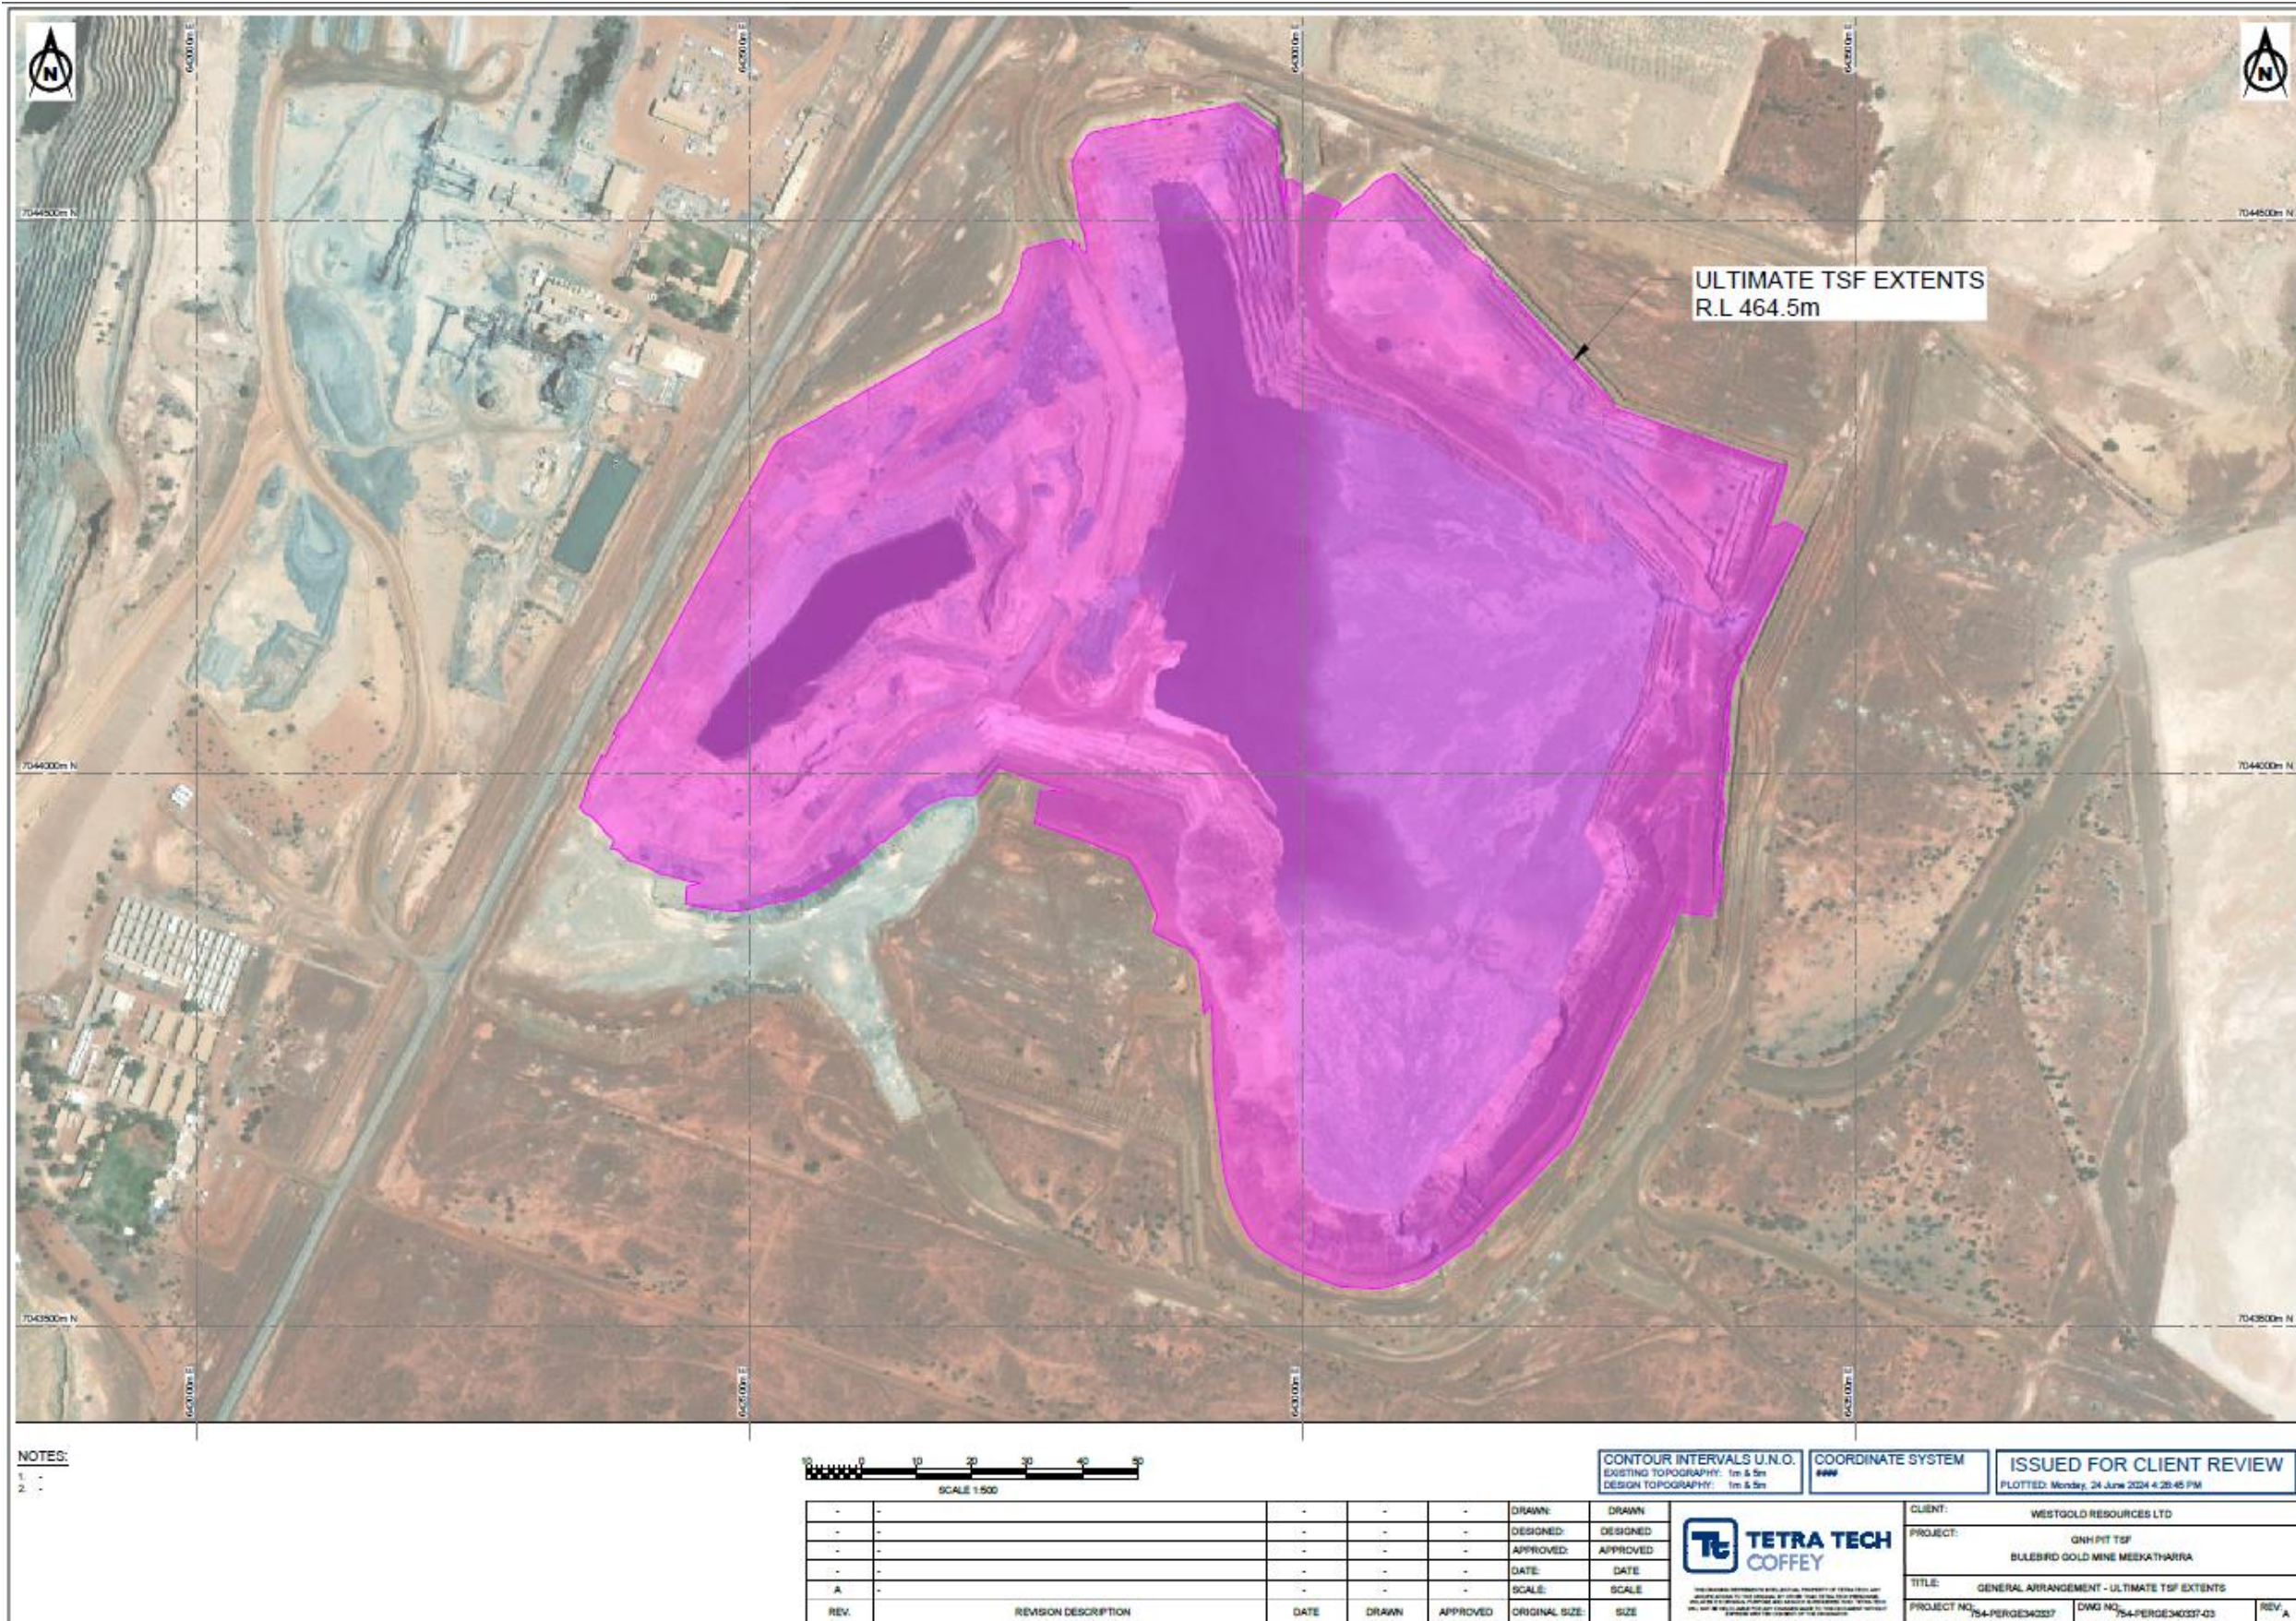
General arrangement – Final TSF extent of GNHIPTSF and BEIPTSF combined
